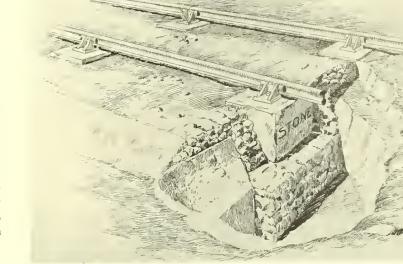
Detail of Philadelphia and Columbia Railroad's "Clarence" rail. The rail was secured by wedges to cast-iron chairs, which in turn were fastened to stone blocks. The blocks were laid in a carefully prepared rock-filled trench. Stone blocks were spaced more closely than indicated in this sketch, however. Compare with figure 63.
